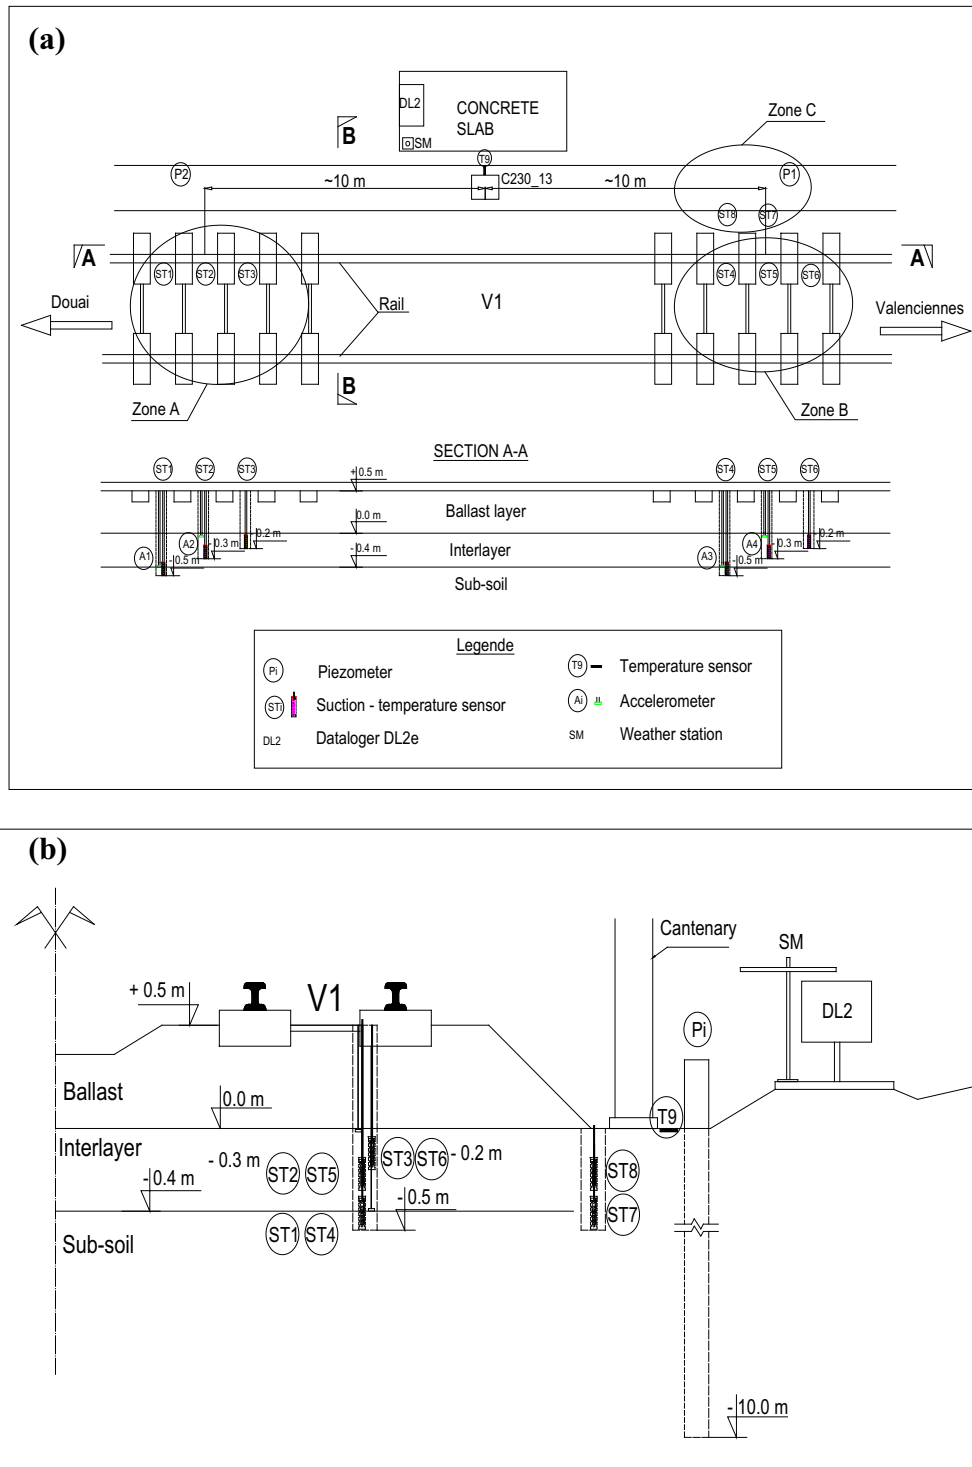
Site instrumentation. (a) Longitudinal section; (b) Transversal section.
